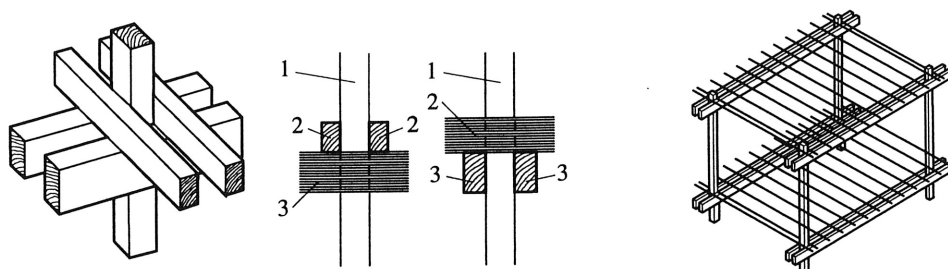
Multiple-piece main supporting beam and single section multistorey column. (1) Column, (2) secondary beam, (3) main beam.
